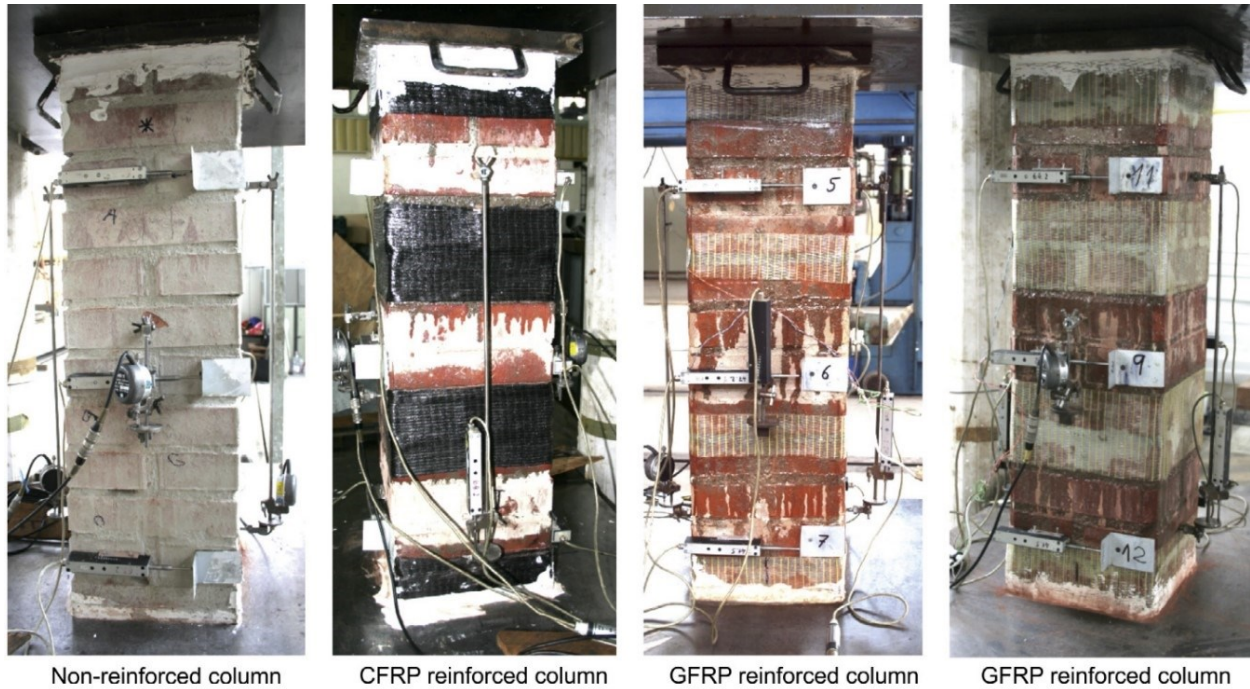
Details of brick masonry columns (Witzany et al., 2014).
